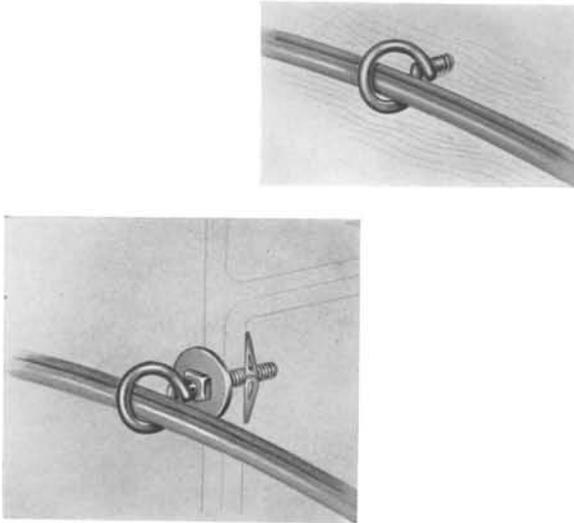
BRIDLE RING AND TOGGLE BRIDLE RING
